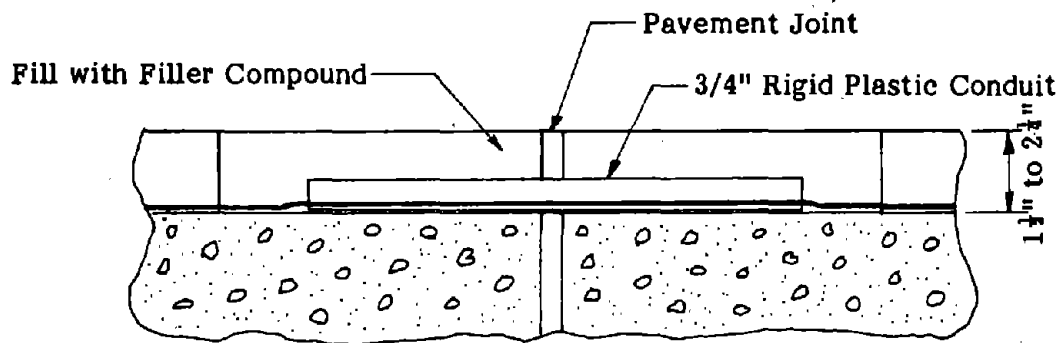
Pavement joint details for loop detectors used by the State of Oklahoma Traffic Engineering Department
